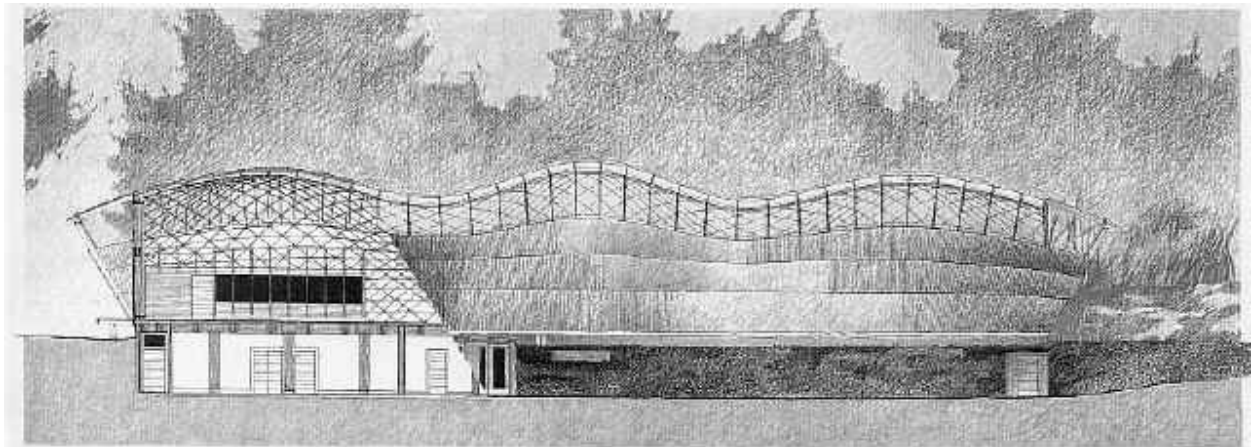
Architect's North Elevation. (Image: Edward Cullinan Architects)
